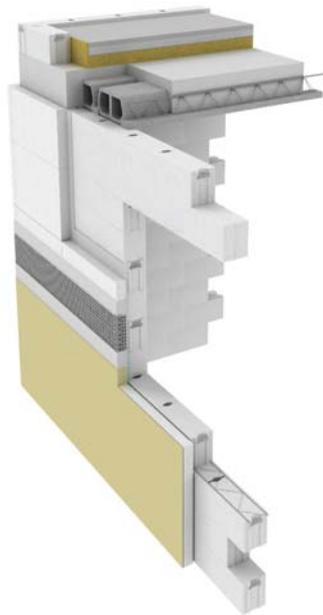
A single – layer wall means significant simplification of a wall's structure.
